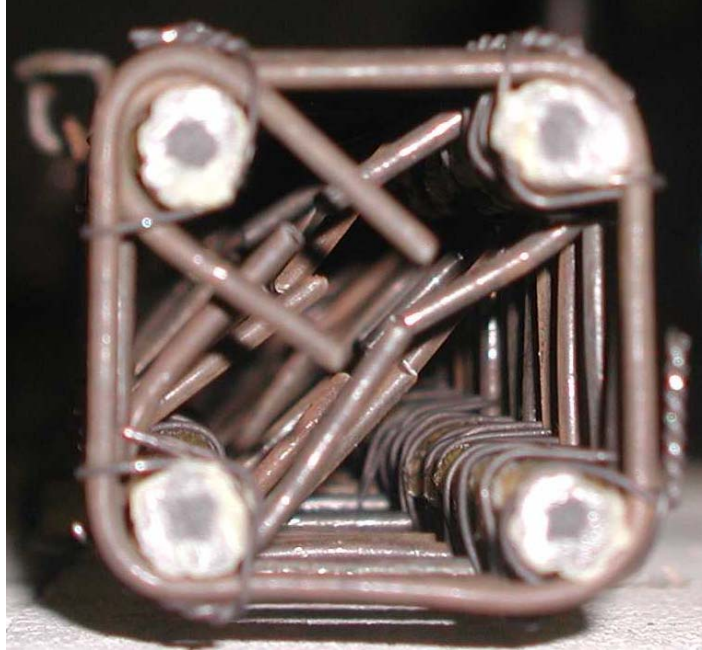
Cross-Sectional View of DFRP Reinforcement Cage for Large-Scale Model Columns.
